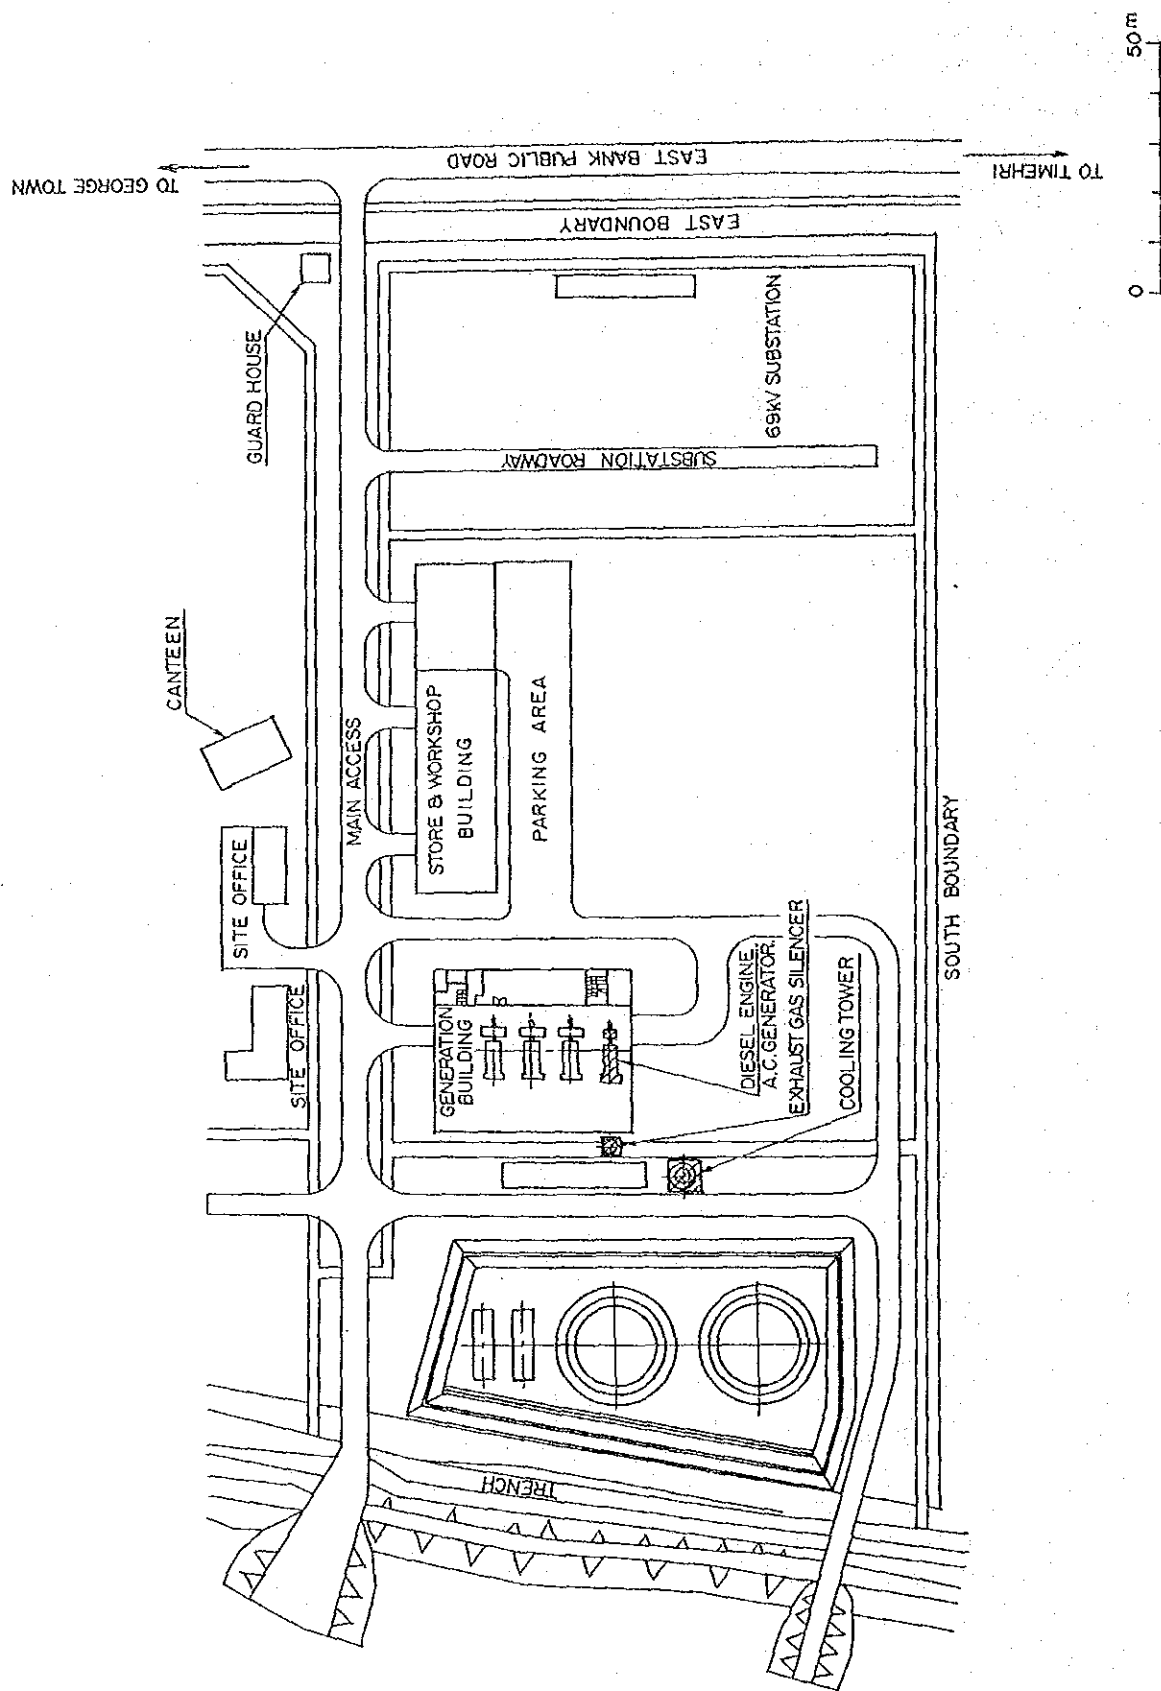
(1) GARDEN OF EDEN POWER STATION
